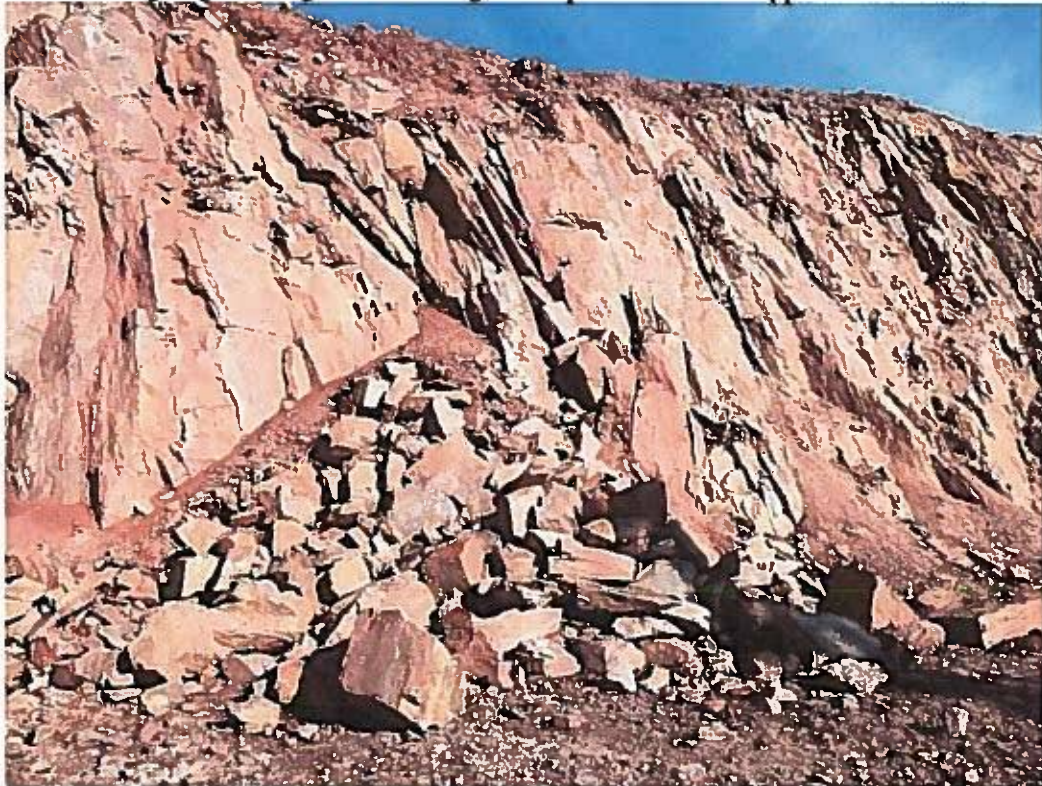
10m high internal wall on 650 Bench. Geologic structure and blast damage contribute to local instability.
